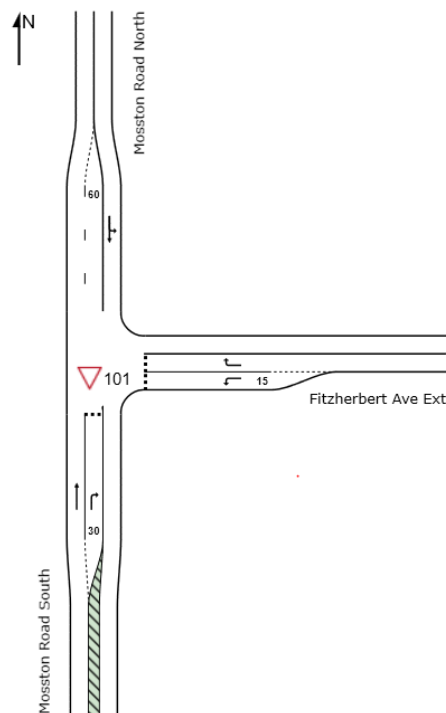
Modelled Layout of the Fitzherbert Avenue Extension / Mosston Road Intersection
